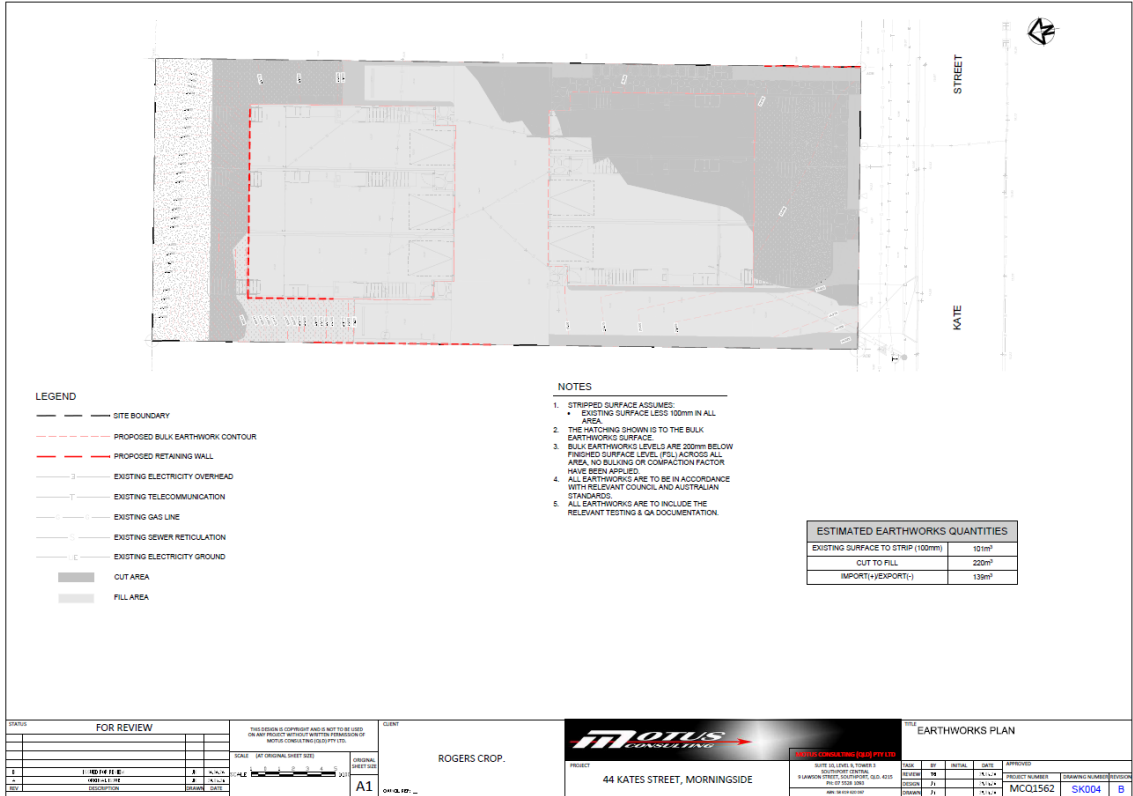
Proposed Bulk Earthworks Plan – Motus Consulting (18 June 2026)
